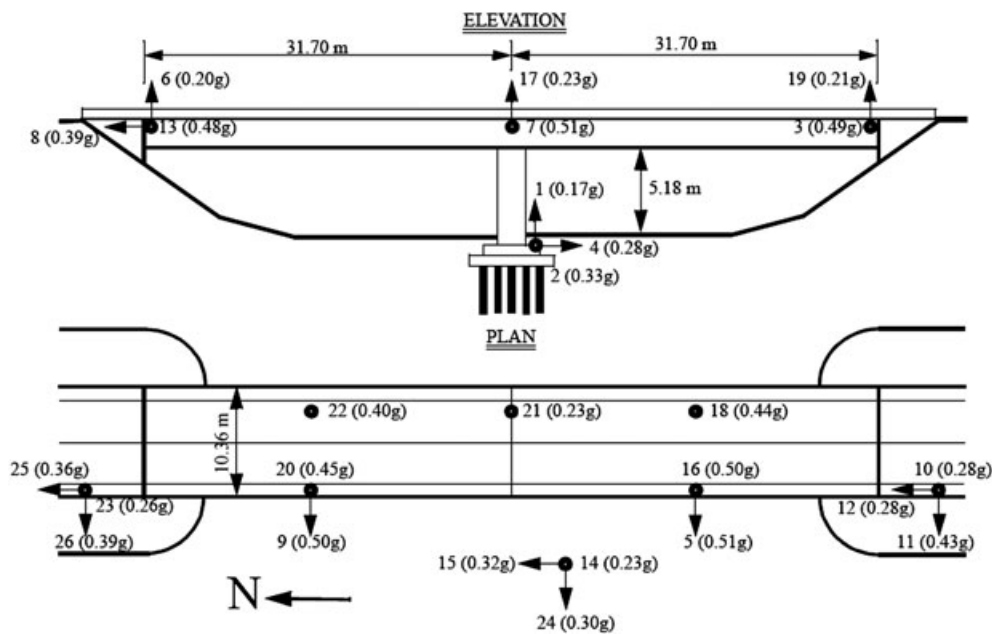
Elevation and plan views of Meloland Road Overcrossing along with locations of accelerometers.
